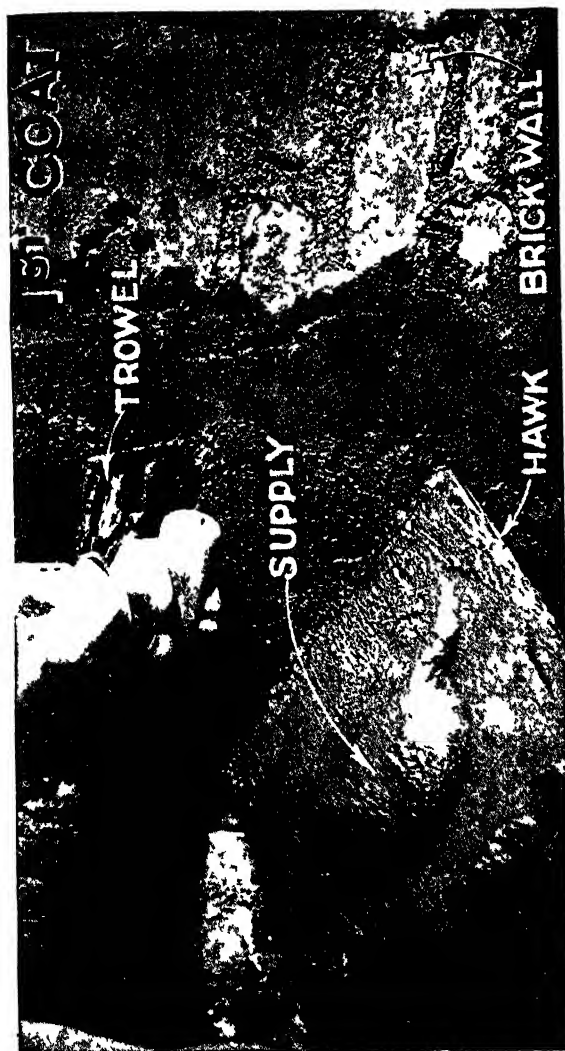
519 —Plastering on brick wall 1st coat showing handling of trowel and hawk
